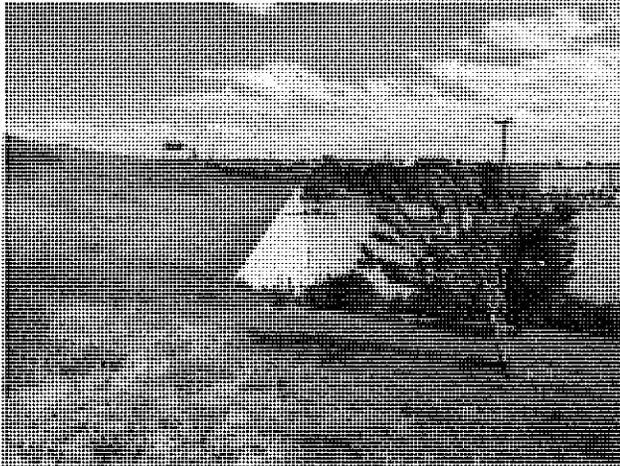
View to the southeast. The bikeway will be an extension of the sidewalk shown here
